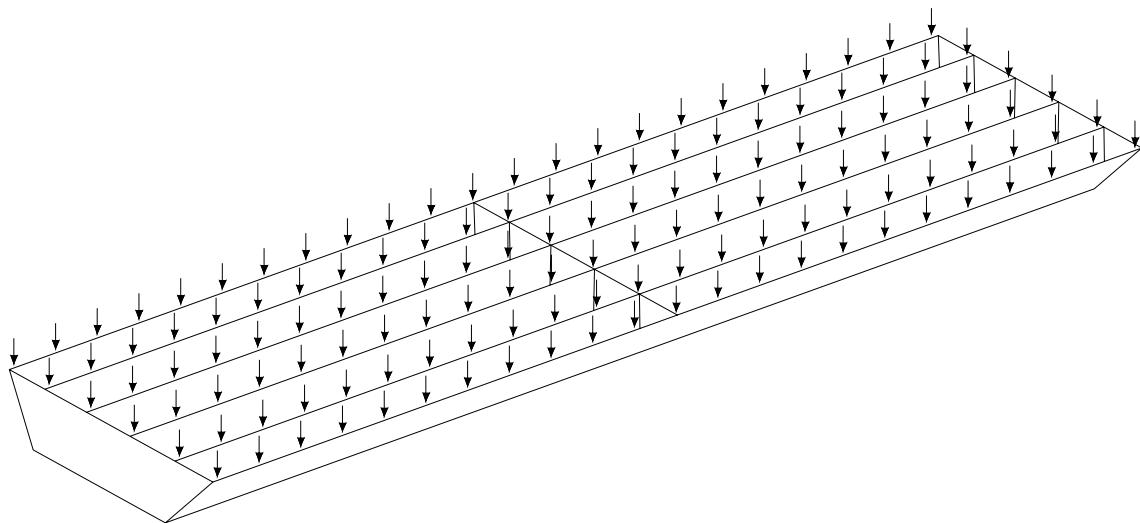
Bridge with No Deck Properties and an Additional Dead Load Applied at Each Girder. Used for Stage 3 in 3D Finite Element Analysis.
